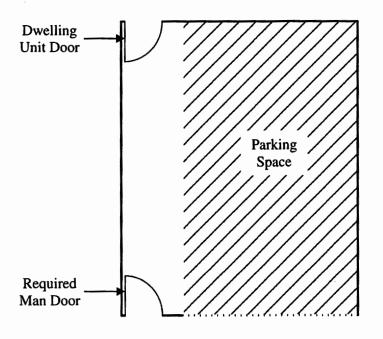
Example of private garage configuration where direct access is provided to a dwelling unit.
